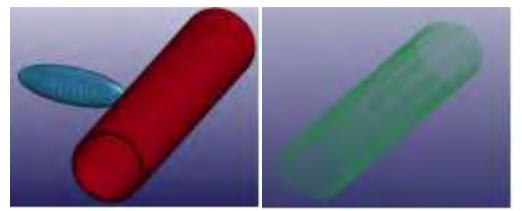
Submerged floating tunnel impact structure, tunnel (concrete) and rebar modeling
